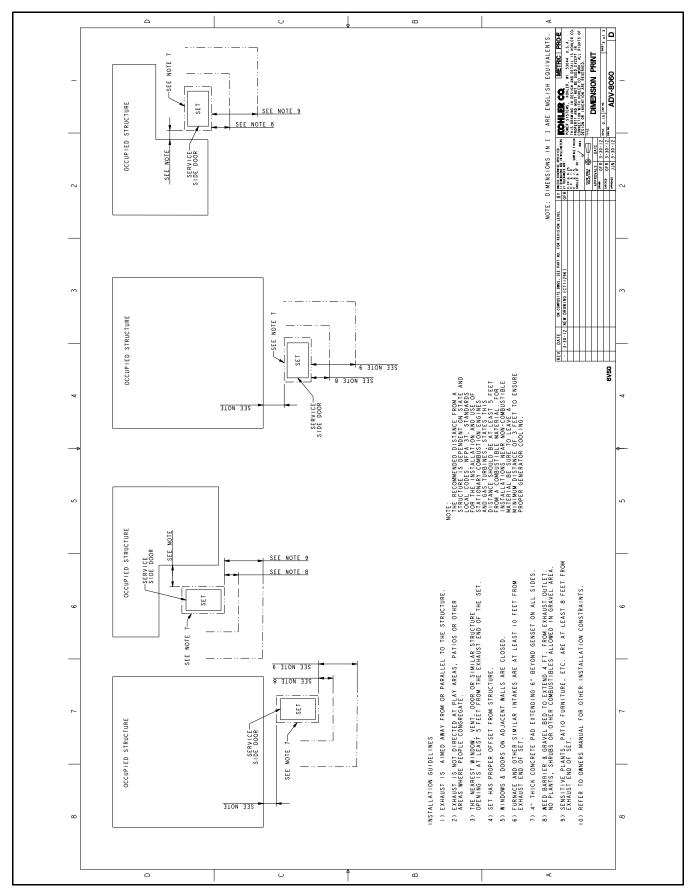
Dimension Drawing ADV-8060, Sheet 3
